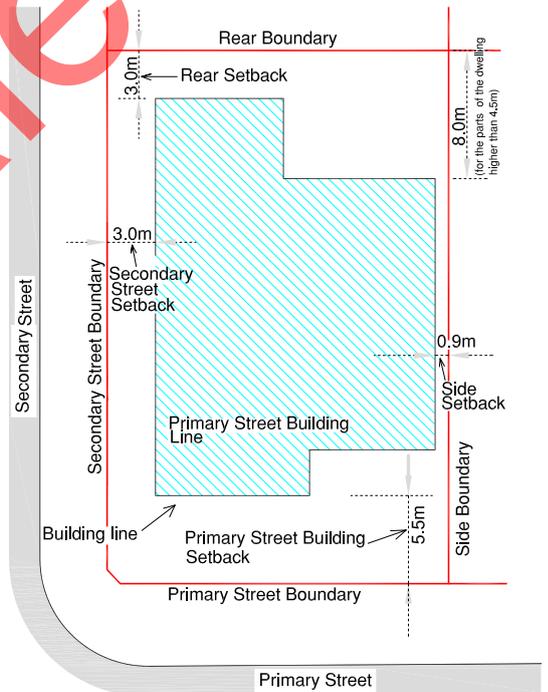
Illustration of the required setbacks for dwelling houses under the Plan
